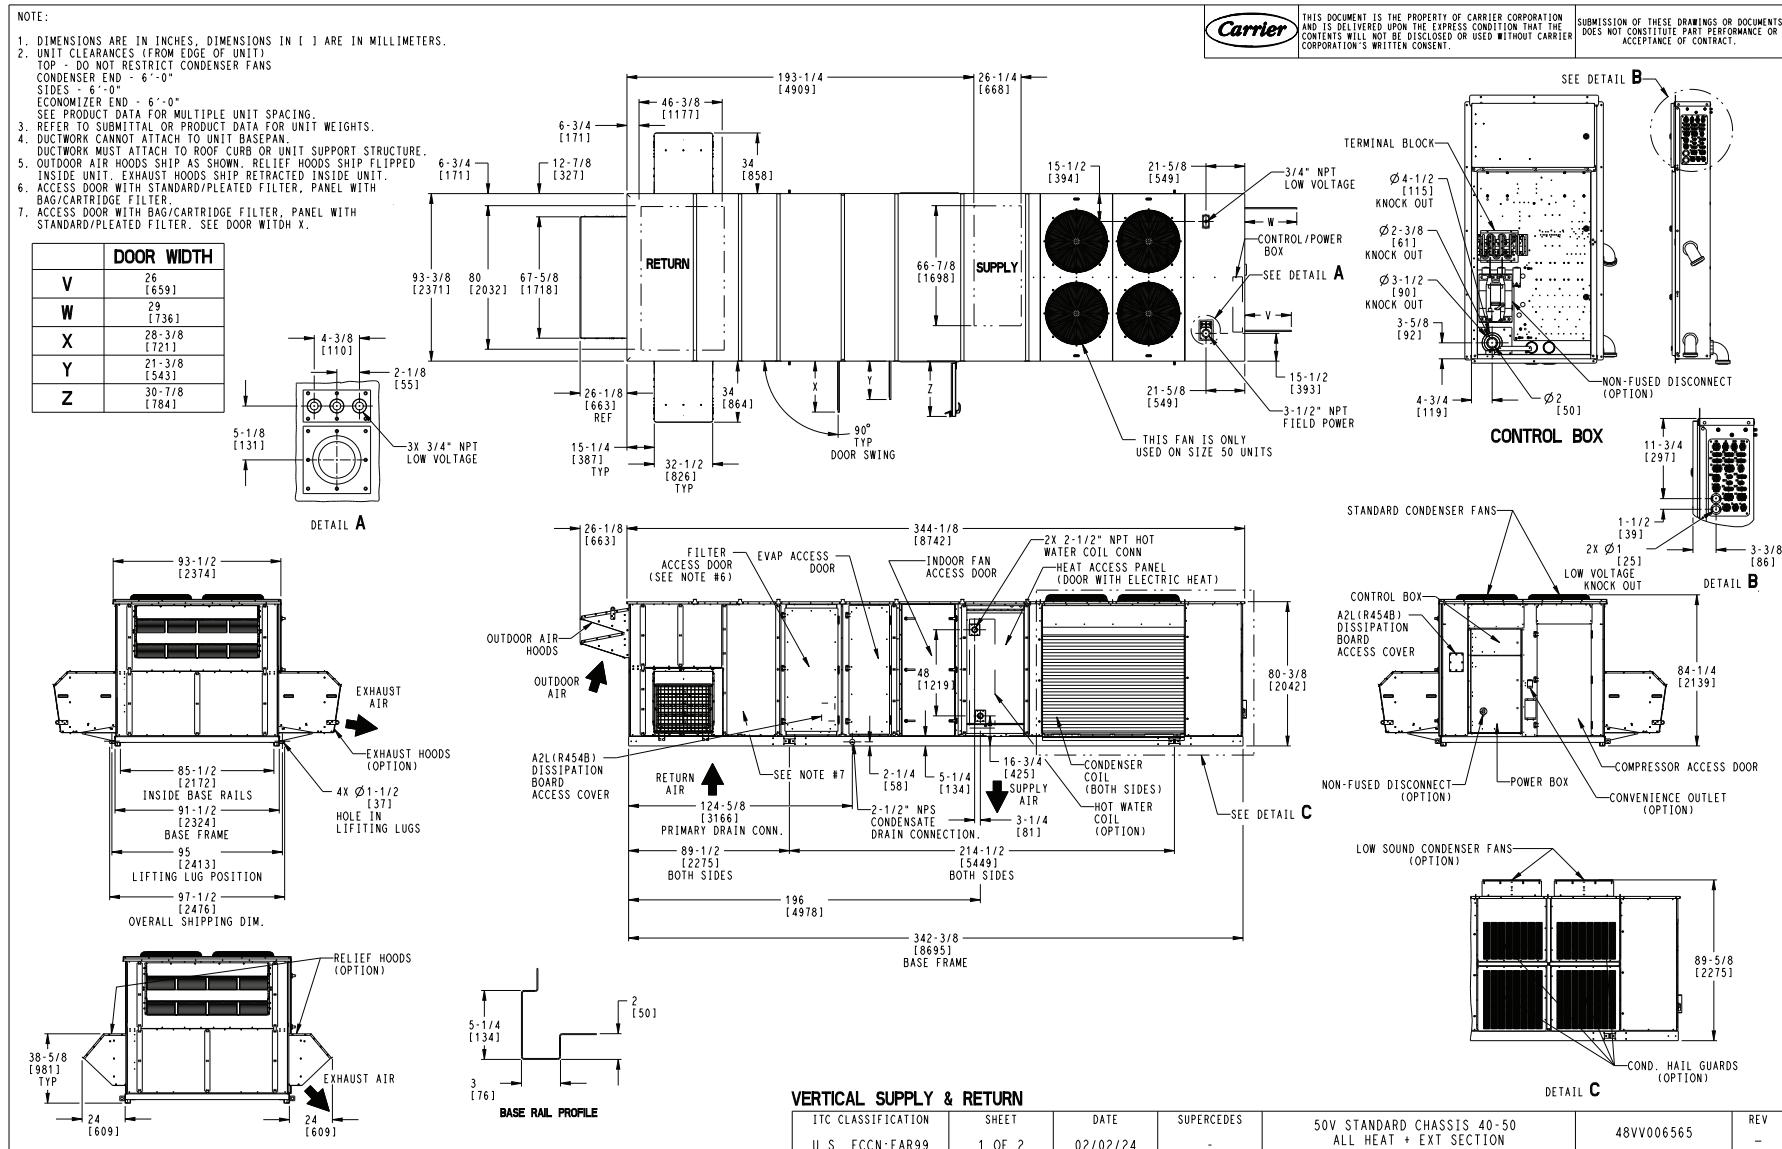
50V 40-50 Ton Extended Standard Chassis
